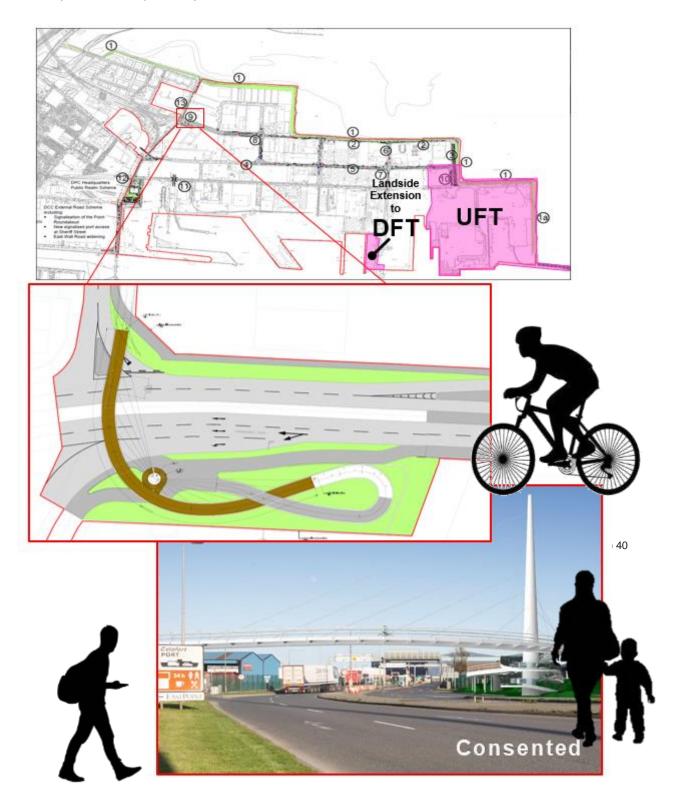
Consented Landmark Bridge Structure to Provide Pedestrian and Cycle Access across Promenade Road
